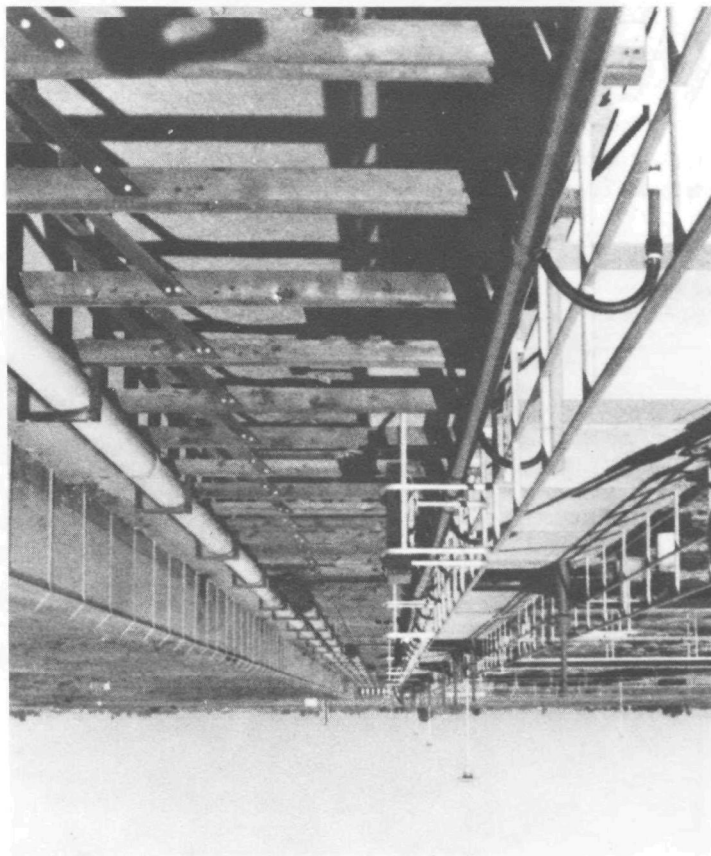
Complete support system for RAS discharge piping, October 11, 1973. (Note Y-wall agitation air header and hose connections along railing at left, and guides to keep PVC piping in alignment at right.)
